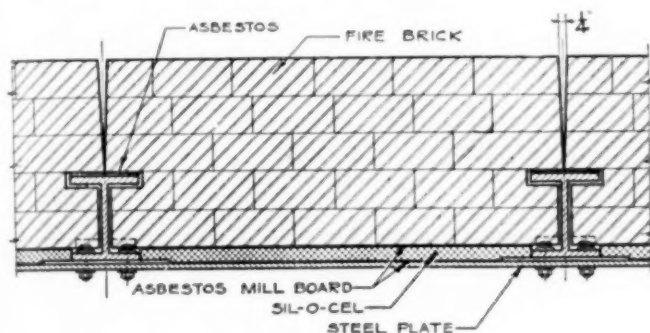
PLAN OF FURNACE WALL AT HELL GATE STATION, UNITED ELECTRIC LIGHT & POWER CO.
